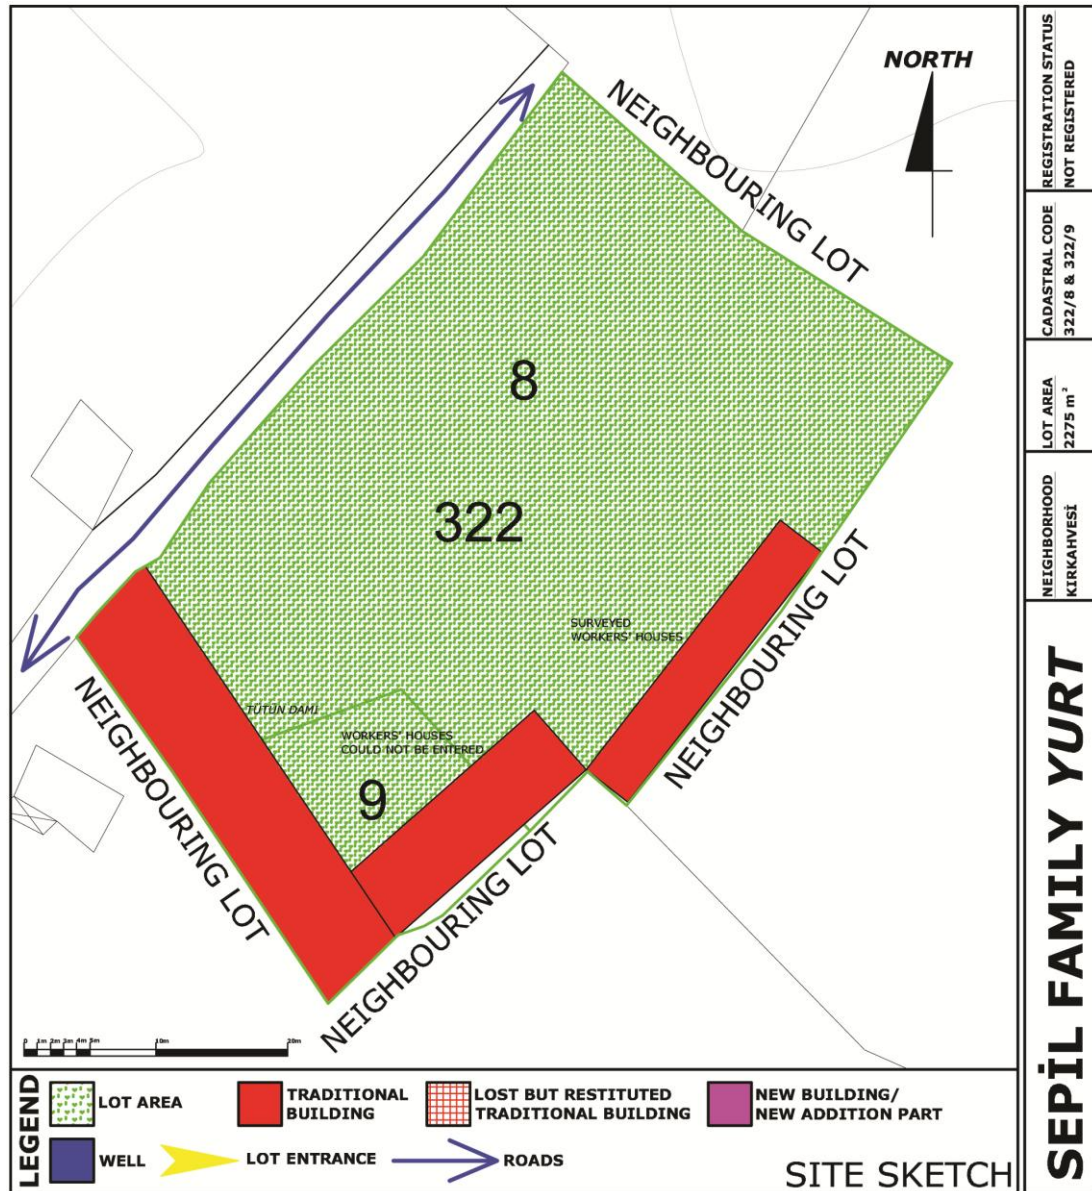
Site plan sketch of the *yurt* of Sepil Family
